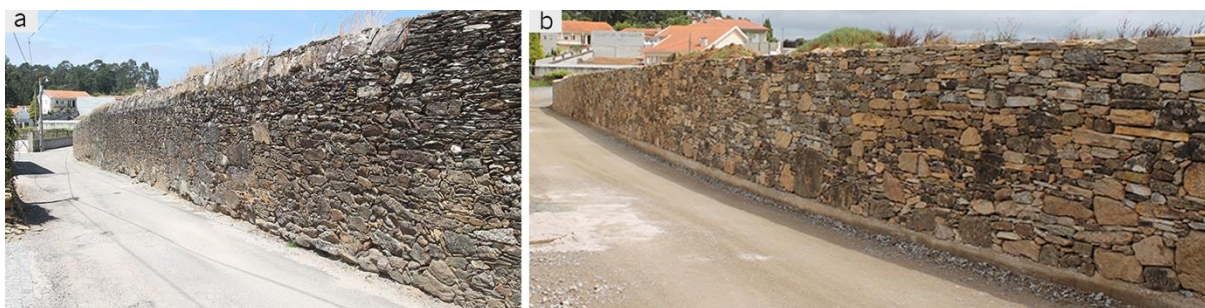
Rebuilding of the farm wall: (a) prior to demolition; (b) new rebuilt wall.
